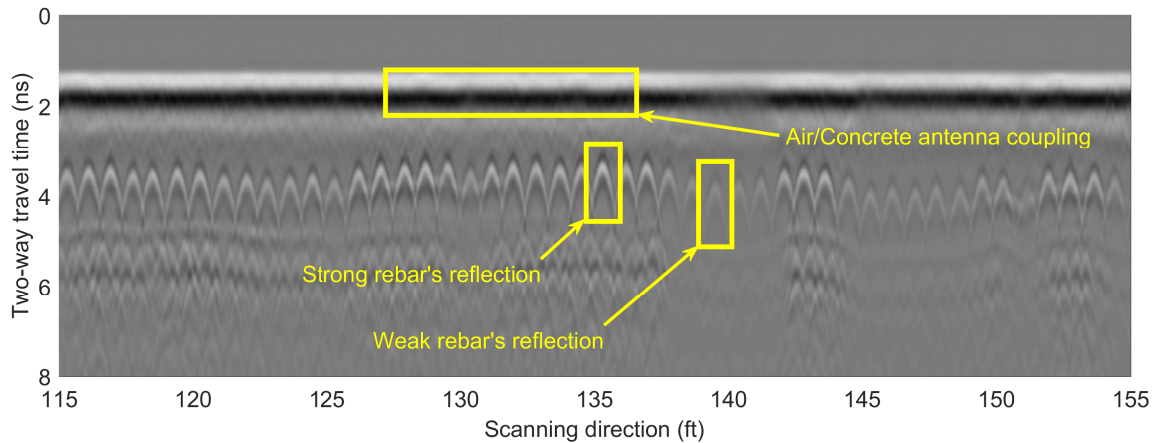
Typical GPR B-scan image from a concrete bridge deck.
